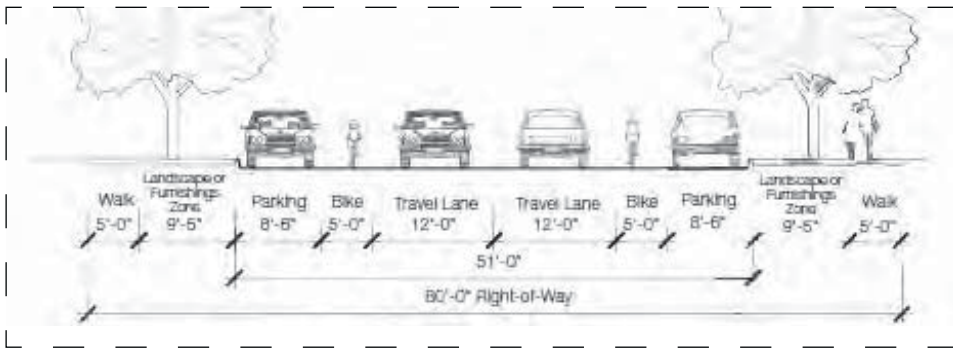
SECTION FROM EBURD CODE FOR 10TH STREET NORTH
